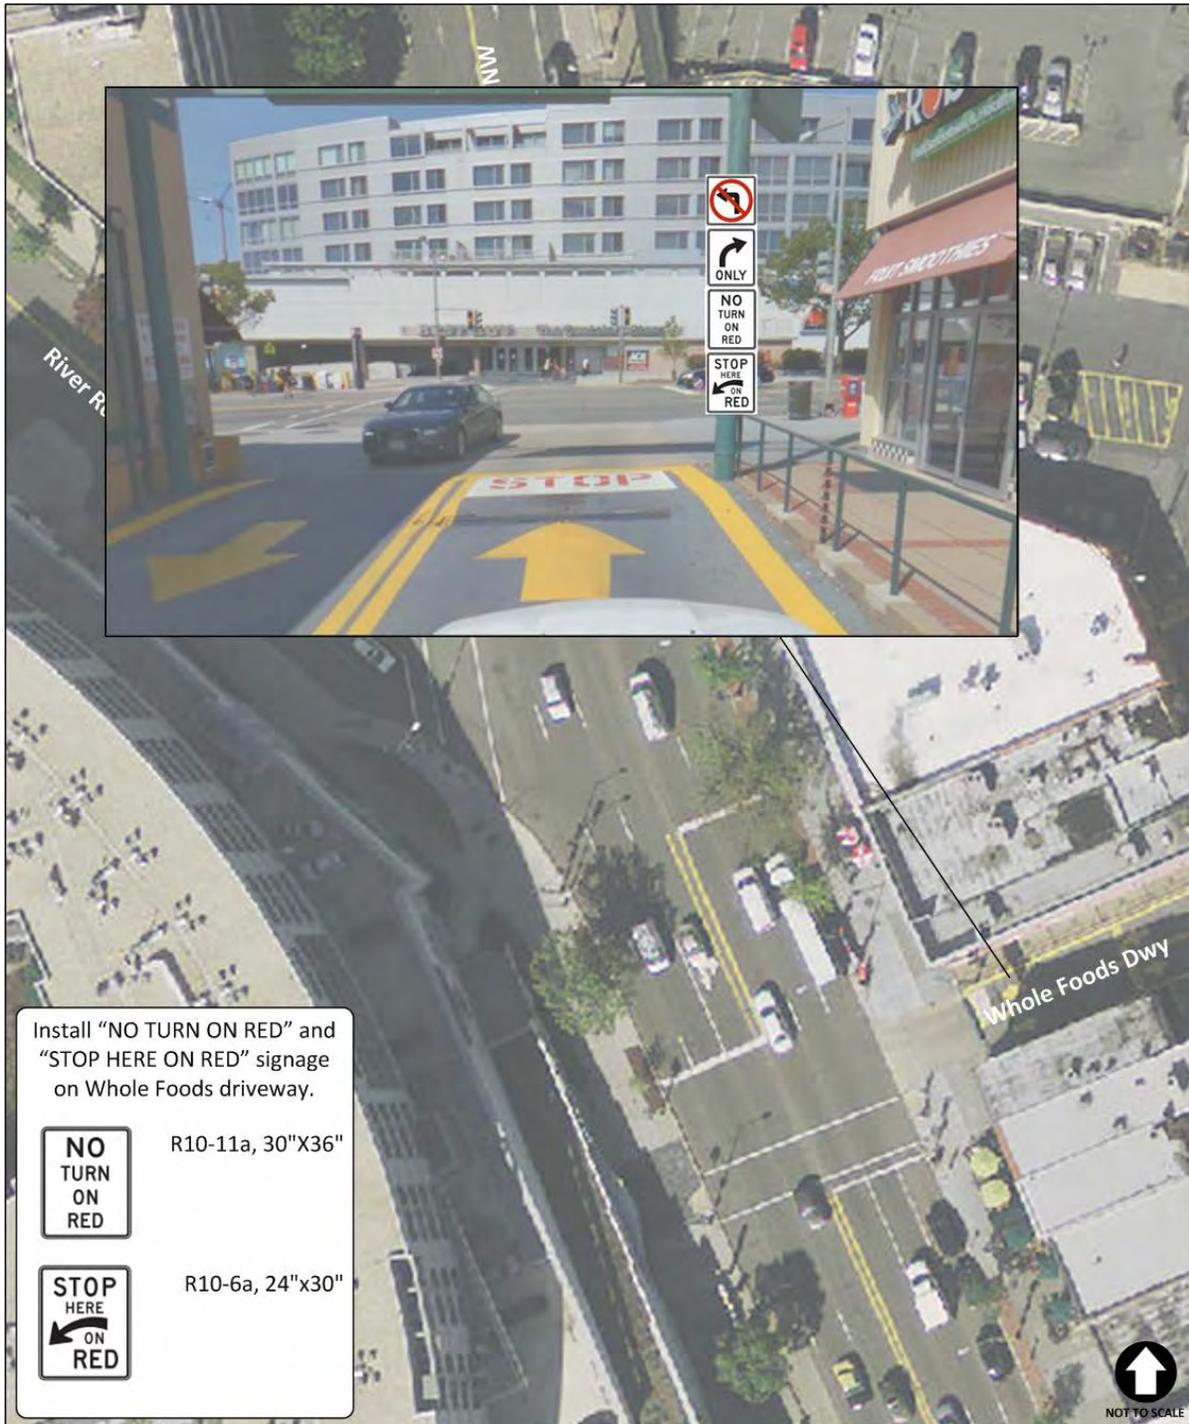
Recommended Improvement – Install Regulatory Signage on Whole Foods Driveway
